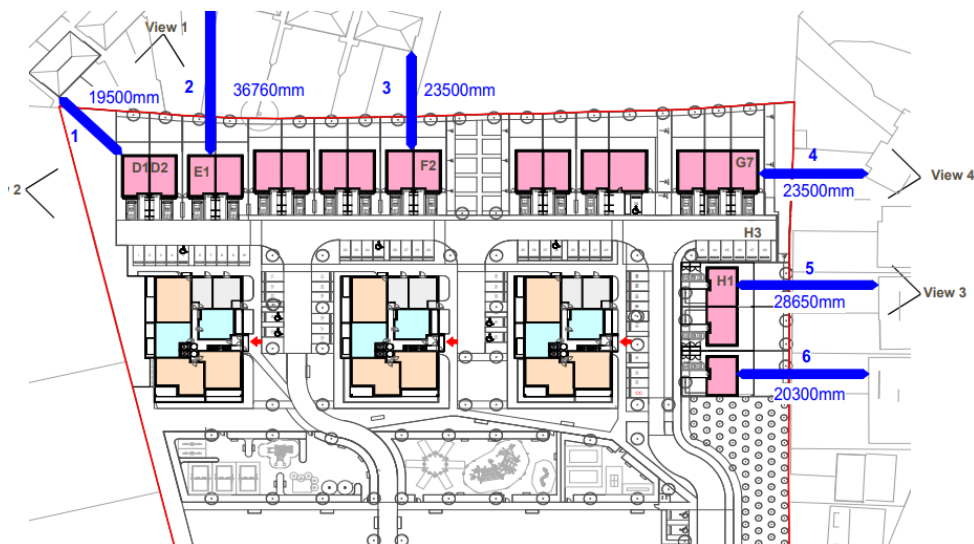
Separation distances to neighbours (Source: Design and Access Statement)
